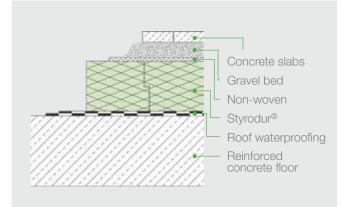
Profile of an inverted patio roof with concrete slabs on a gravel bed.
